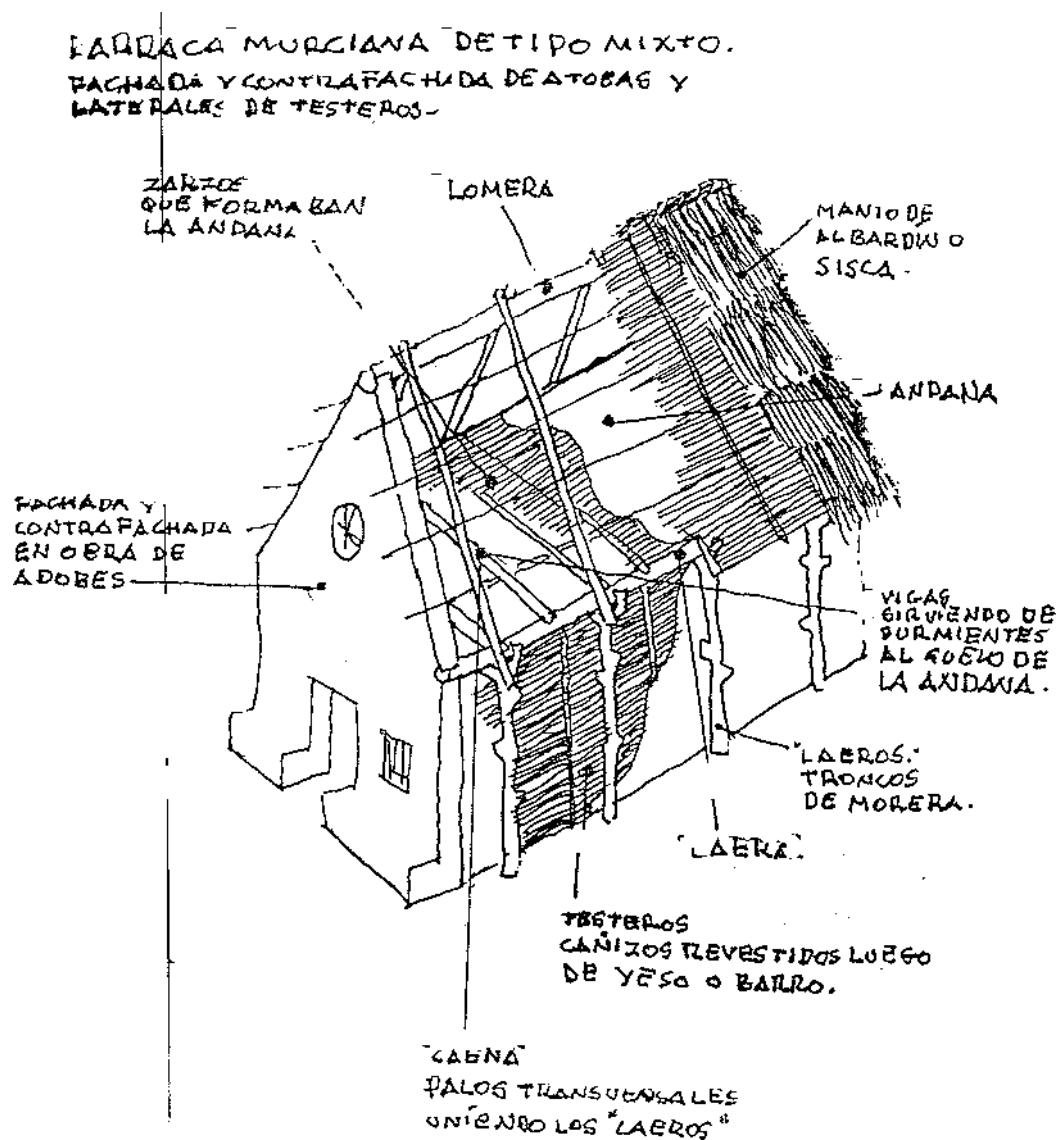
Axonometric drawing of the mixed type murcian barrack. (Source: Ethnographic Museum of Alcantarilla.1970).
